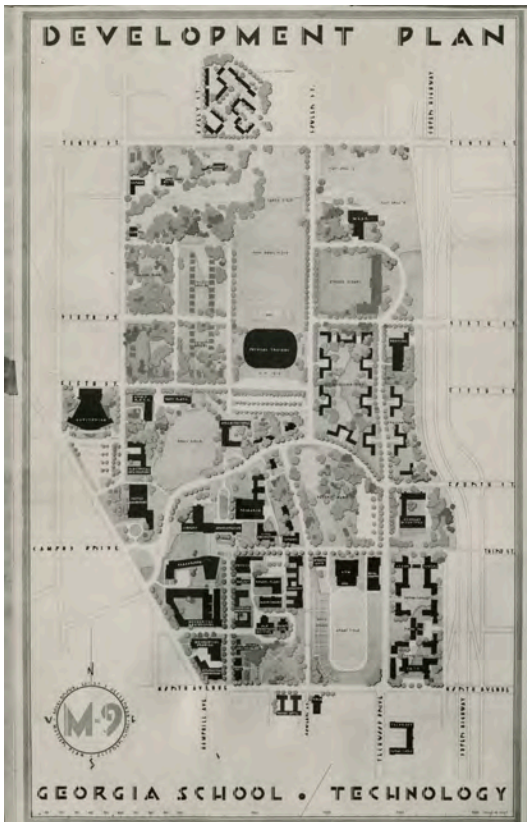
M-9 Campus Master Plan, 1946. Georgia Tech Facilities Department Photographs and Slides
